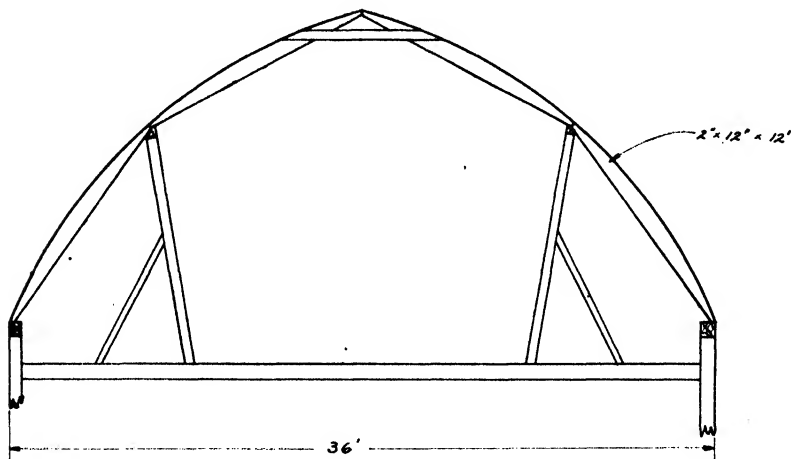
An early type of Gothic Roof made of 2"x12" plank.
